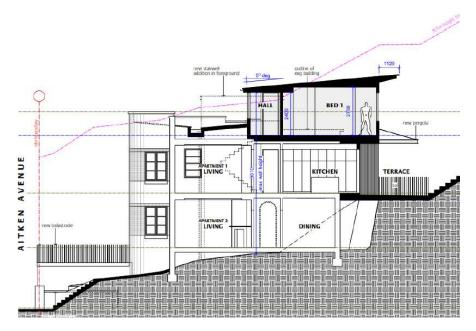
Plan extract showing the extent of building height breach along the southern edge of the proposed upper-level additions with the extent of breach consistent with the existing upper-level parapet breach associated with the 2 storey street facing building element
